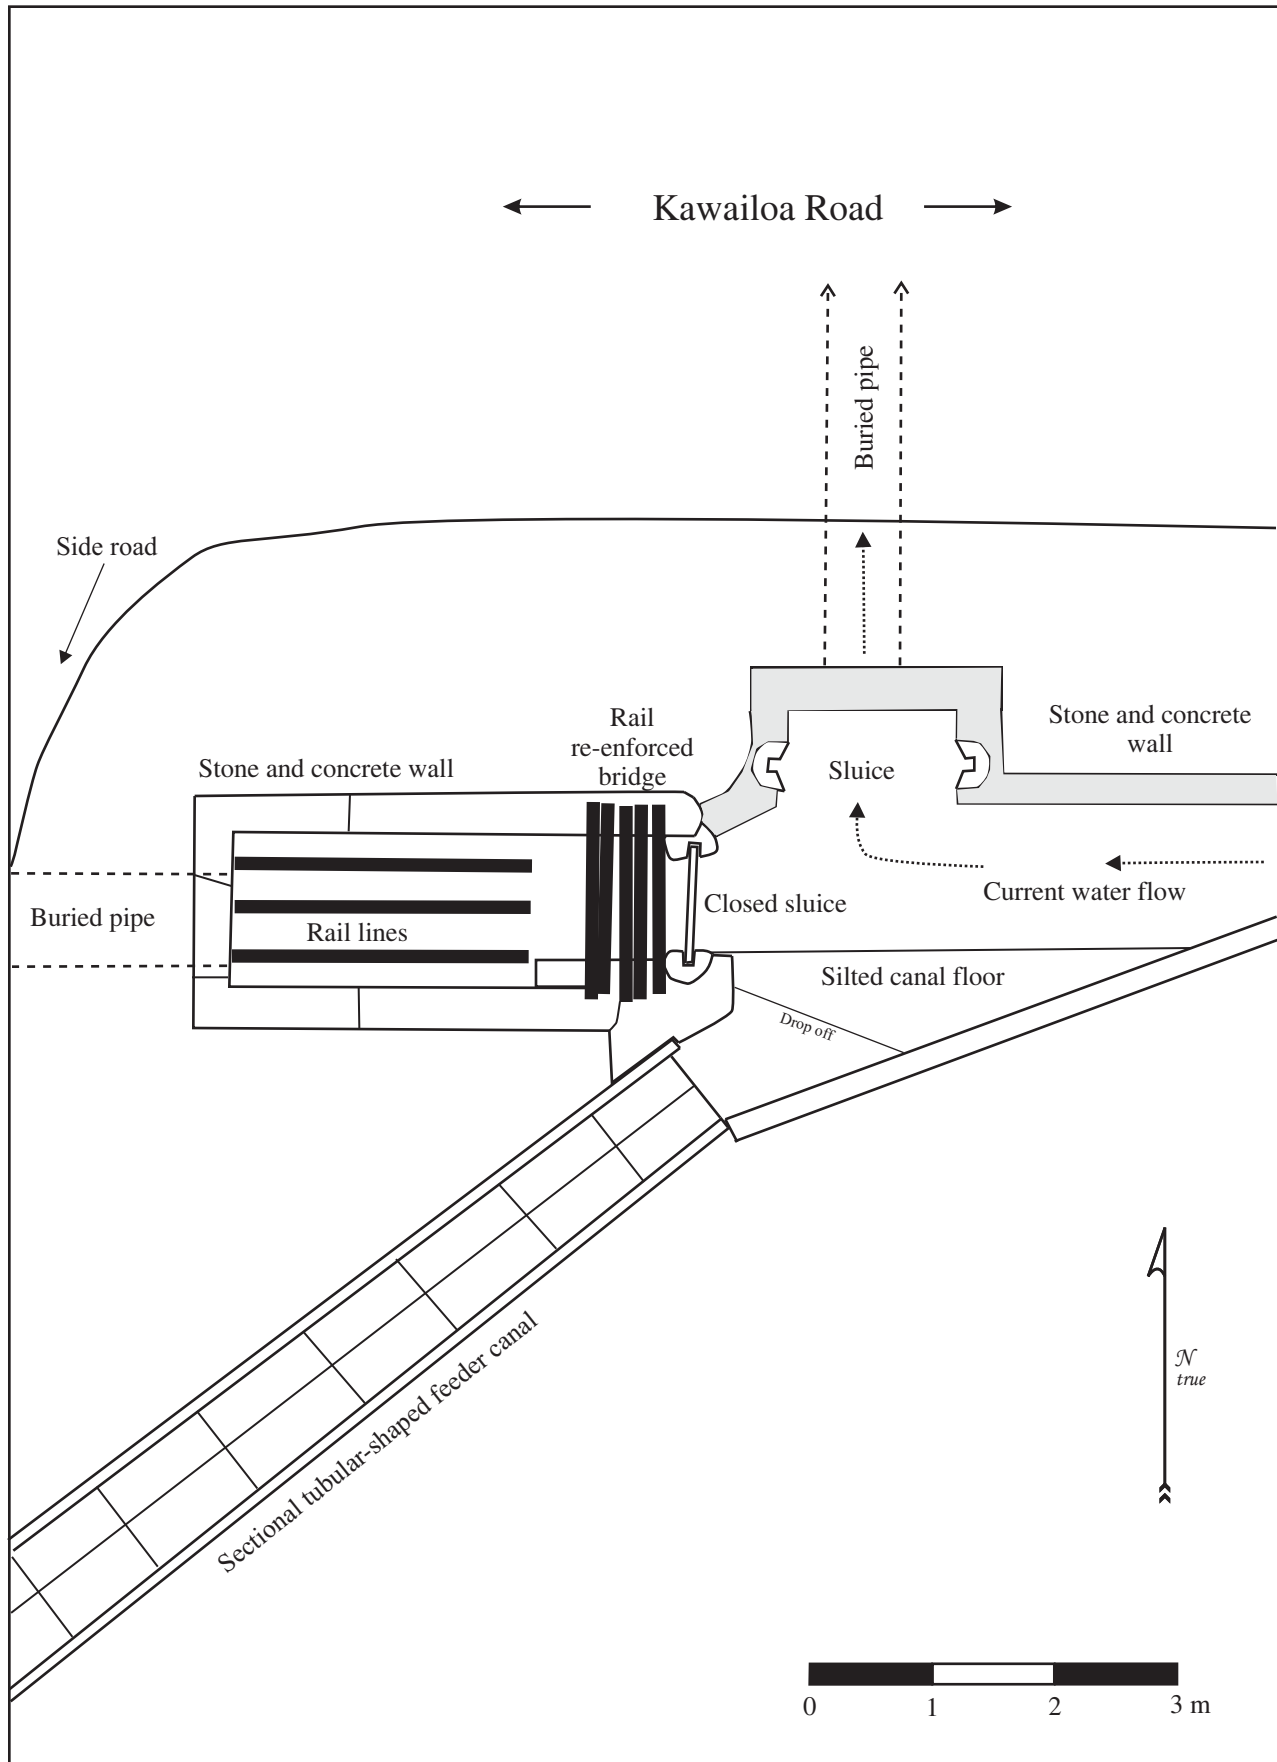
Site 7159 Section 7 terminal sluice gate complex plan view.
